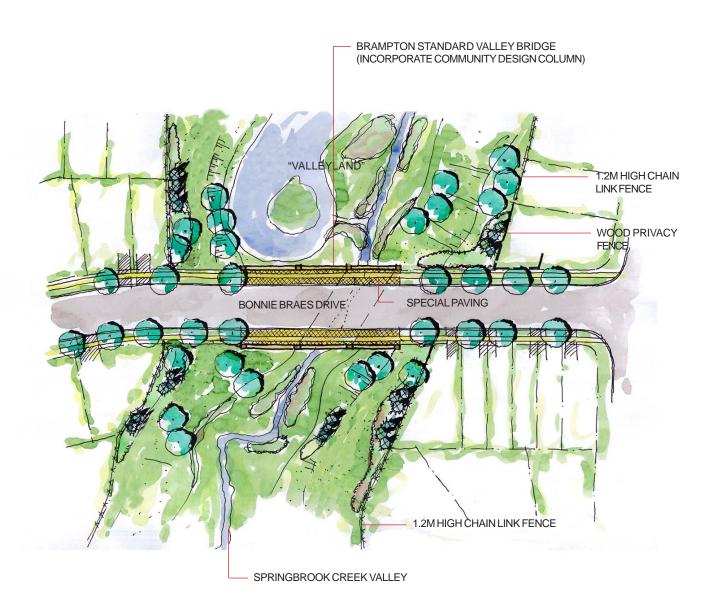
Bonnie Braes Drive - valley crossing plan view
